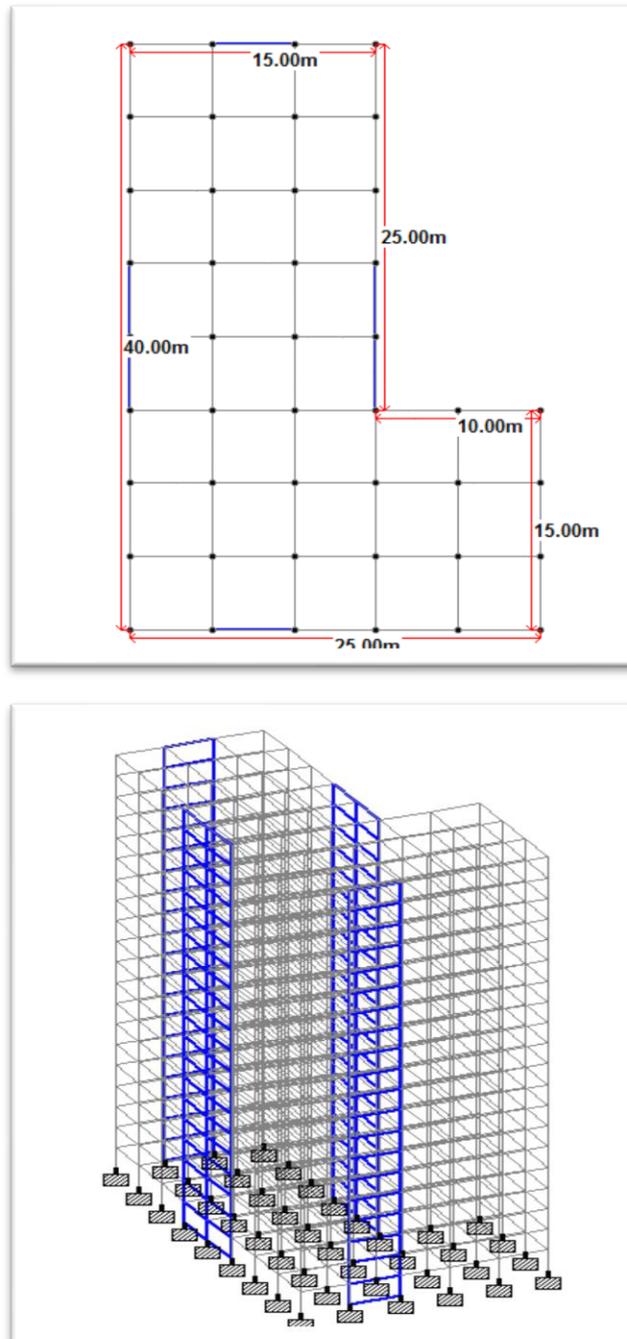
Plan and Isometric view of CaseIV
